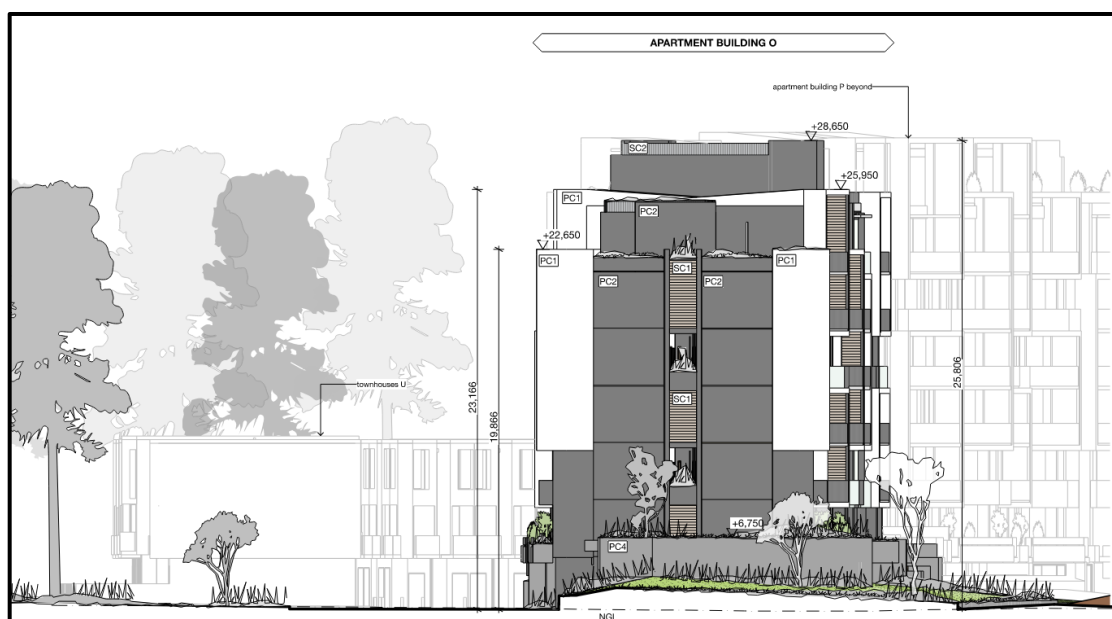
The western elevation of Building O showing the roof top garden on the sixth level. The trees bordering Cadbury Road and the proposed townhouses are in view, with Building P in the background.
